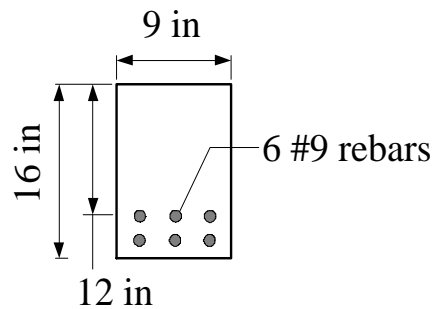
Section dimension and arrangement of longitudinal reinforcement steel rebars for section UHP/St60 16R-3
